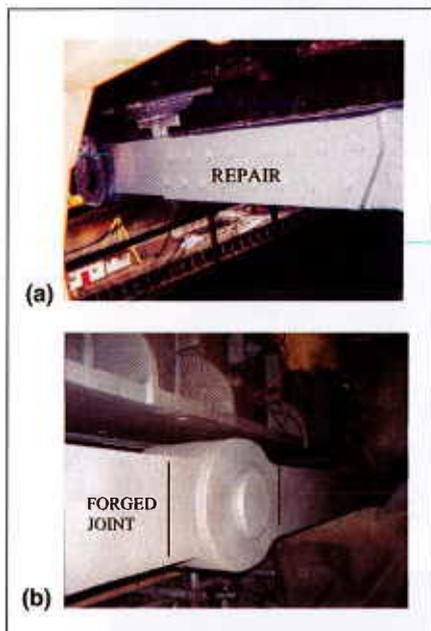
Tie chain link assembly: (a) showing repair; (b) showing forged joints.
